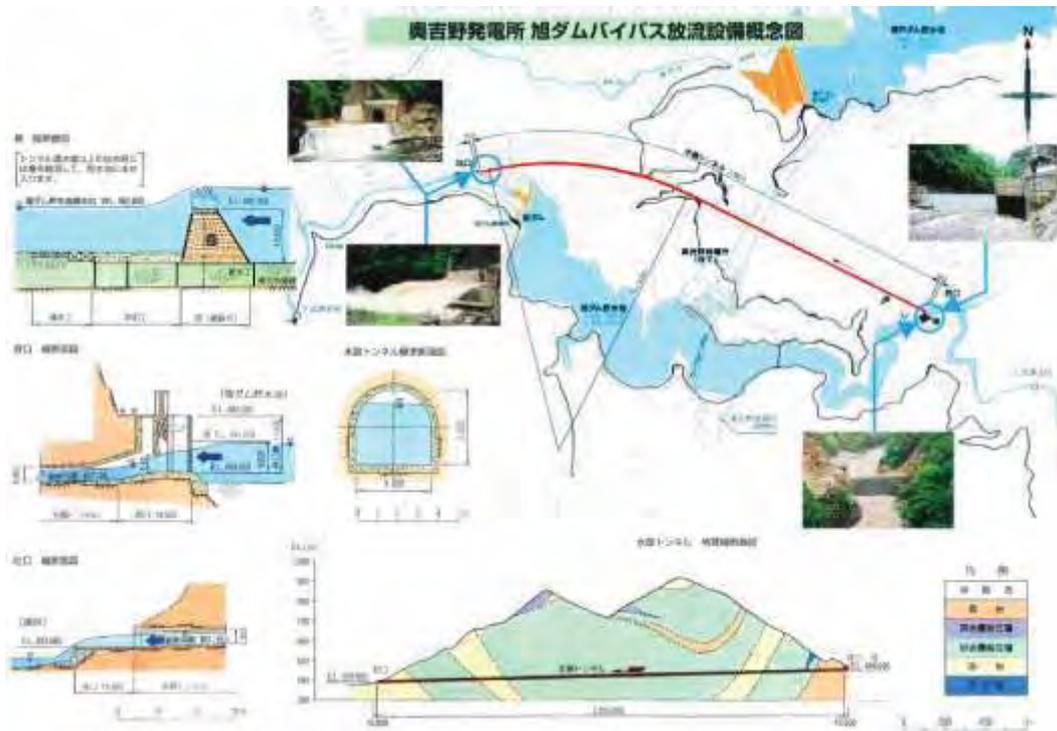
Overview of the Asahi Dam sand discharging bypass facility
